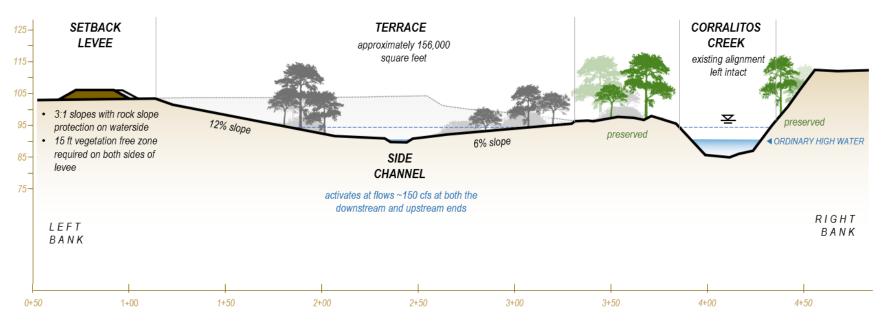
Proposed Side Channel/Terrace #3 Cross Section
